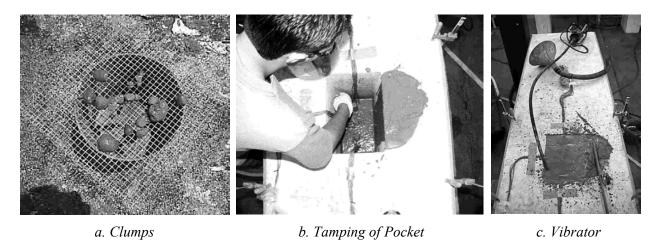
Grouting Operations for Single Line Grout Pocket—2
